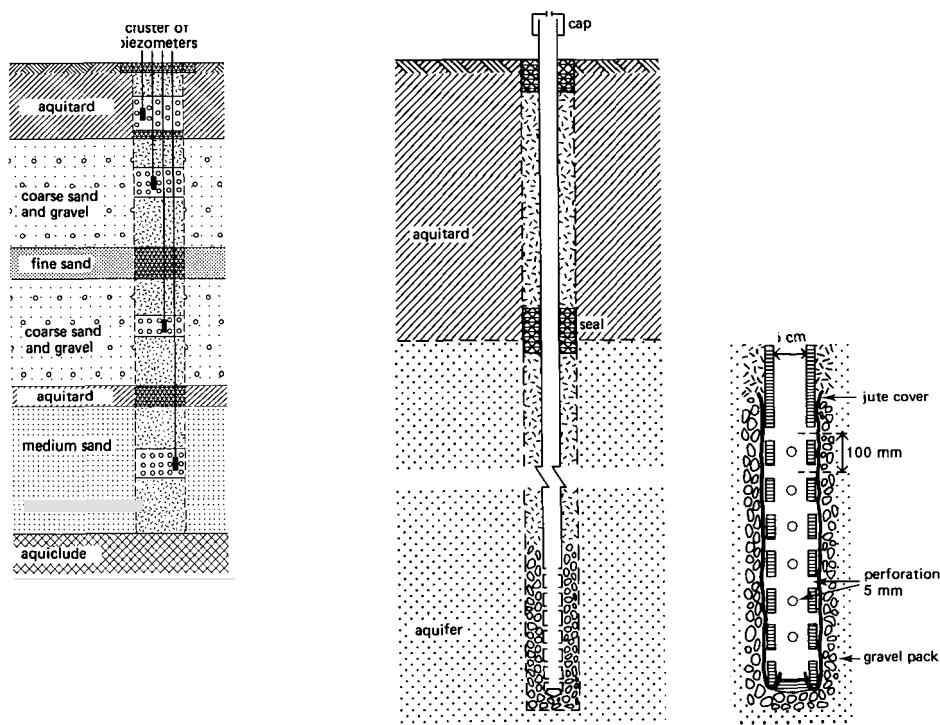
Multiple piezometer well and the cross-section of a piezometer
